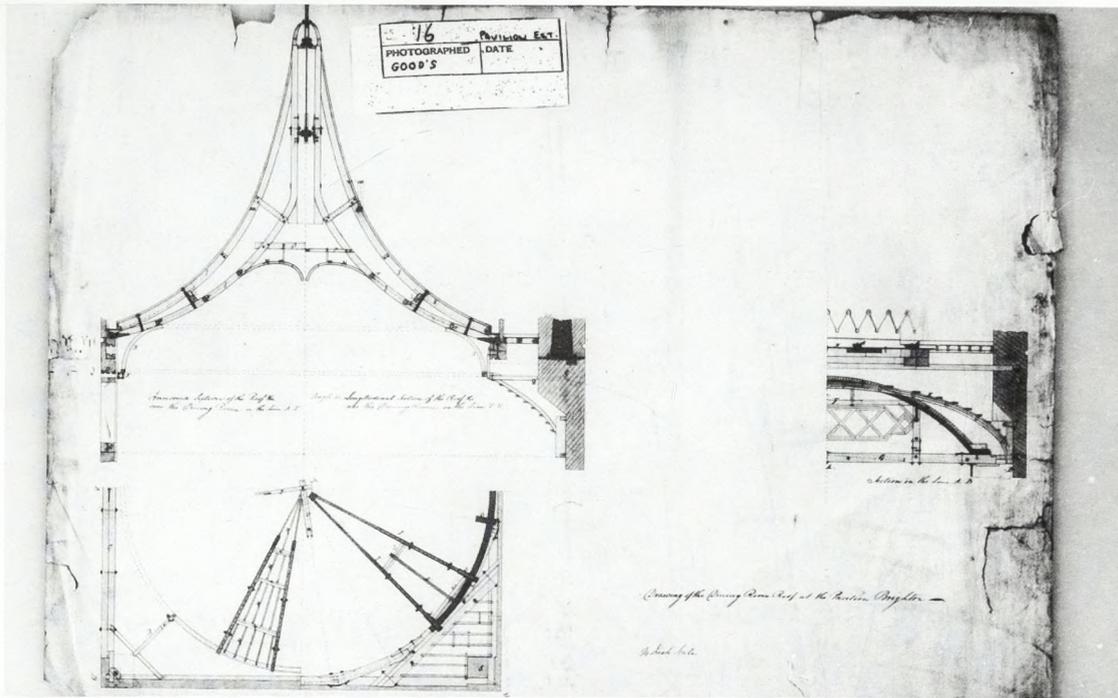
Brighton Pavilion: section through Banqueting Room roof, drawing by William Nixon, 1827. (Figs. 13, 14, 15 by courtesy of the Keeper of Fine Arts, the Royal Pavilion, Brighton)
